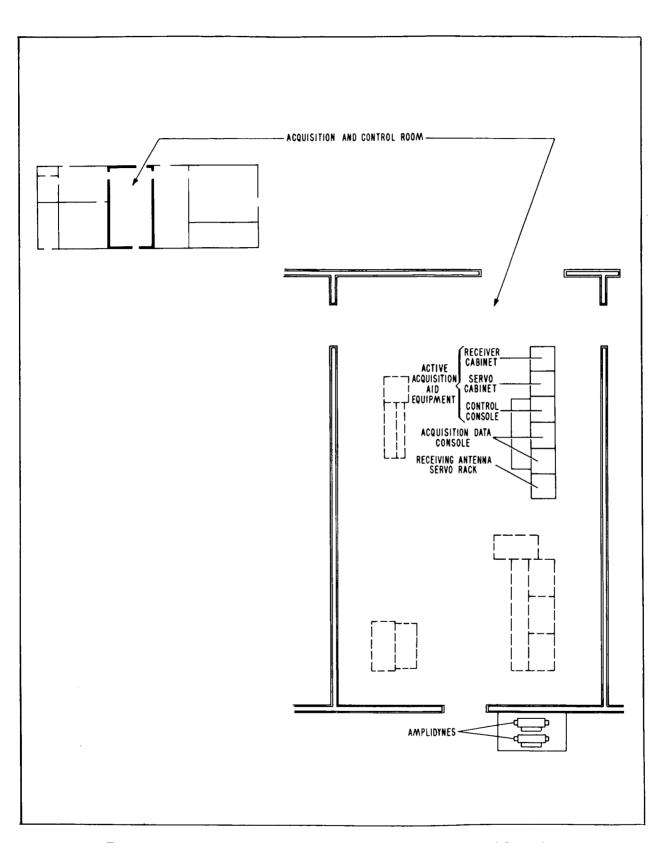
Acquisition System Equipment Layout, Telemetry and Control Building
